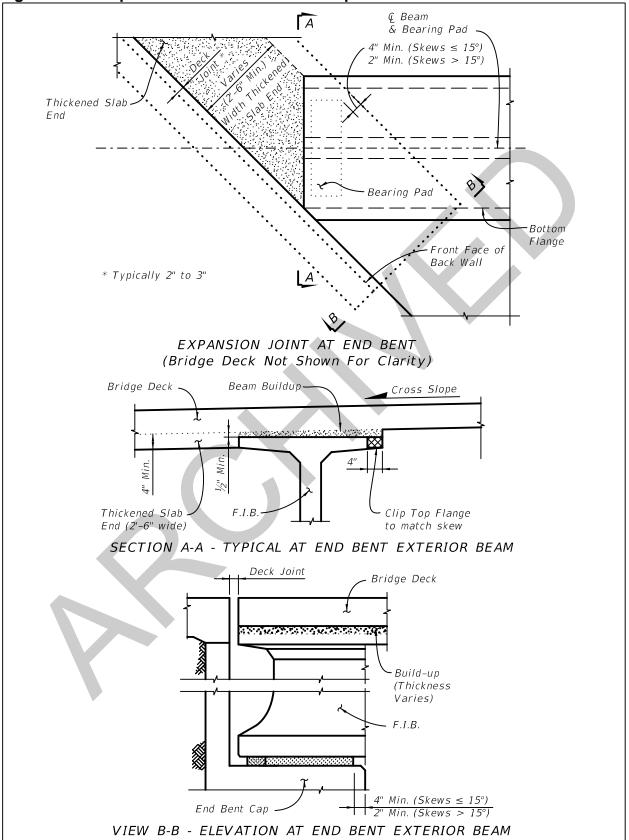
Squared Beam End Details – Expansion Joint at End Bent
